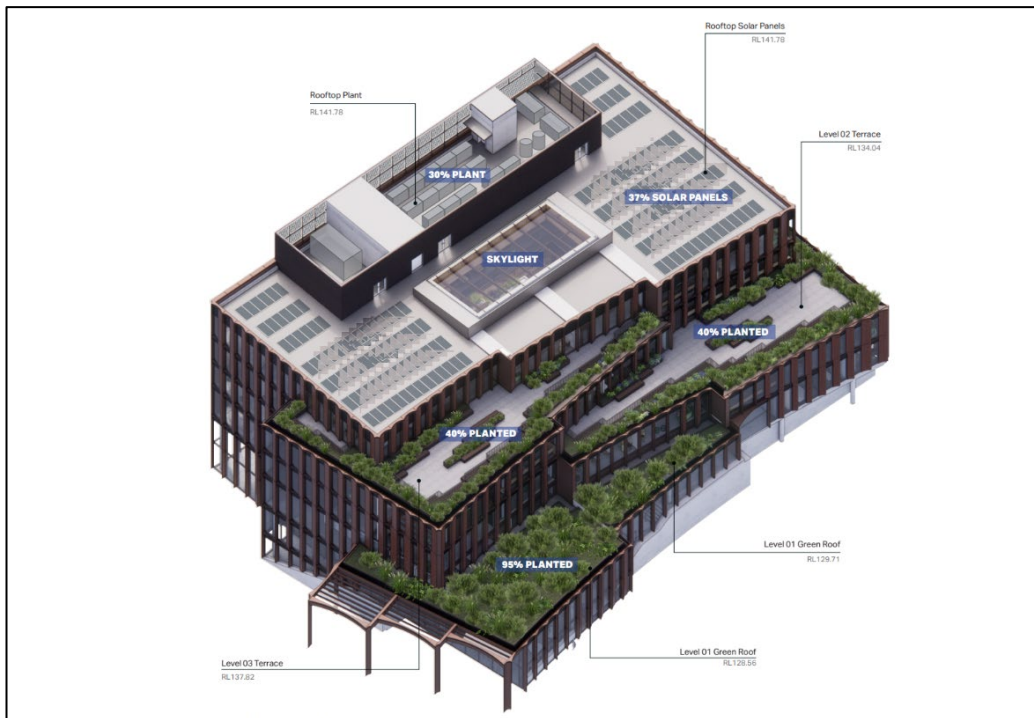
| 3D perspective of the proposed SIP building showing roof and terraced areas (Source: Applicant's EIS 2025)
